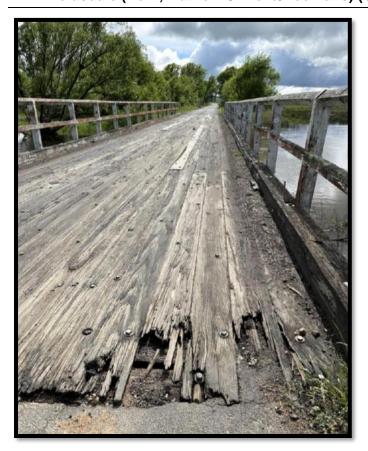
Timber bridge deck Bridge 2 (source: Macrozamia Environmental Consulting)
